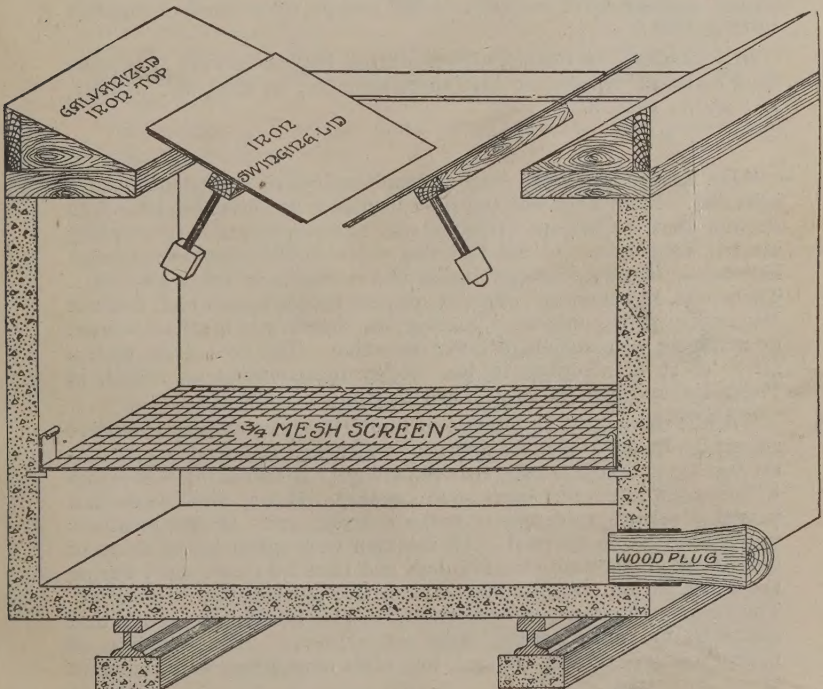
Shaw's Fly-proof Concrete Rubbish Bin.
